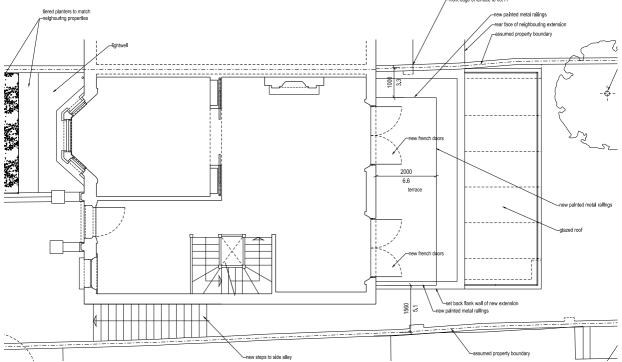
The upper ground floor plan of the application 2016/1295/P shows the approval of a roof terrace for the B Plain of 17 Nassington Road.
